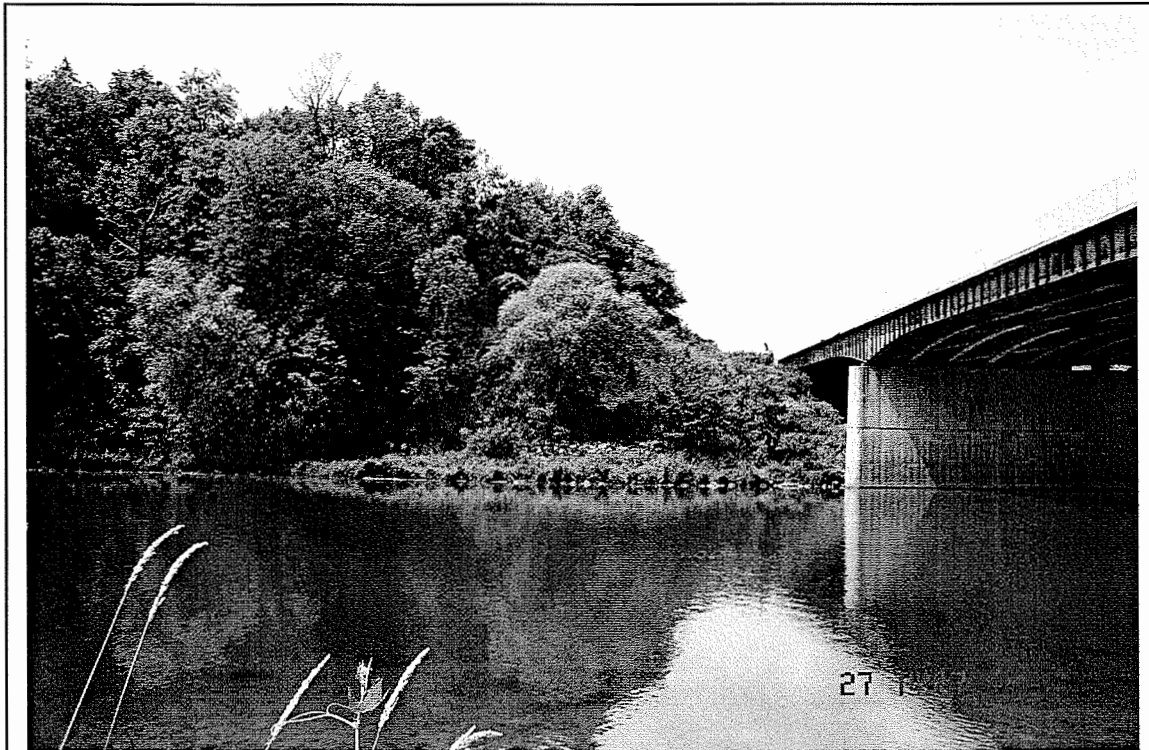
, July 2006 – Looking from flood plain on south side of Grand River towards North Abutment and Piers 1 and 2. Existing bridge on right side of photo.
